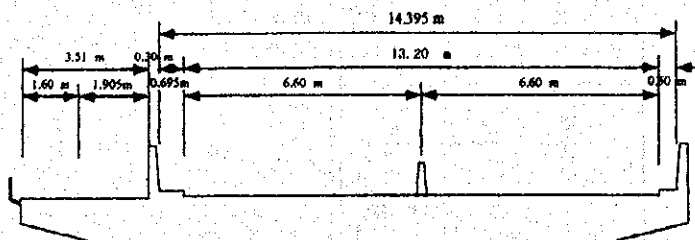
shows the proposed typical cross section for the Rupsa Bridge based on the selected scheme of Phase 1 Study and that of other major bridges in Bangladesh, and Fig. 5.2 shows the typical cross sections of embankment and bridge other than Rupsa Bridge.
